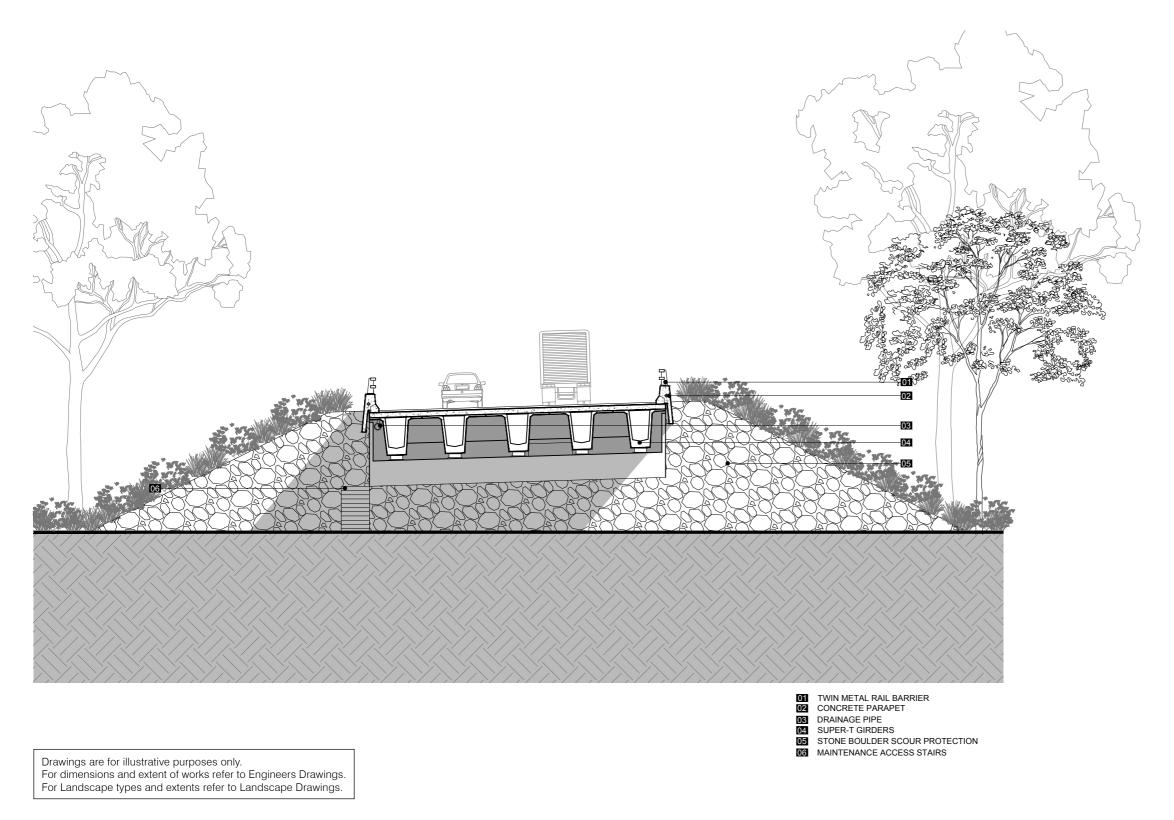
Northbound Bridge over Fauna Crossing: Cross Sectional Elevation
